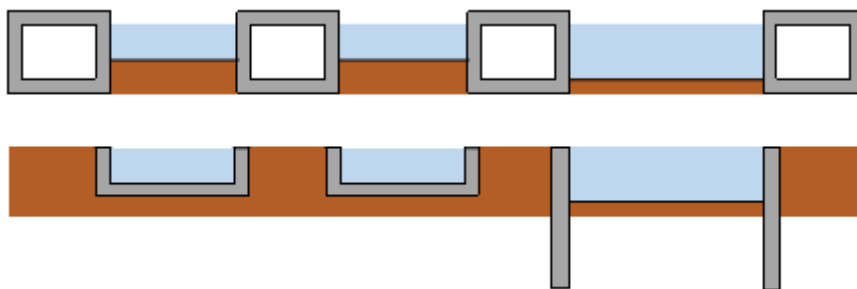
Immersion construction options for lock locks (upper: immersed walls, lower: immersed locks)
